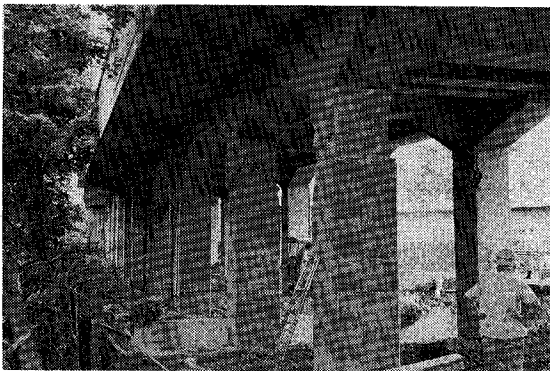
Cracks in a Concrete Frame (Off-Miyagi Prefecture Earthquake 1978).
